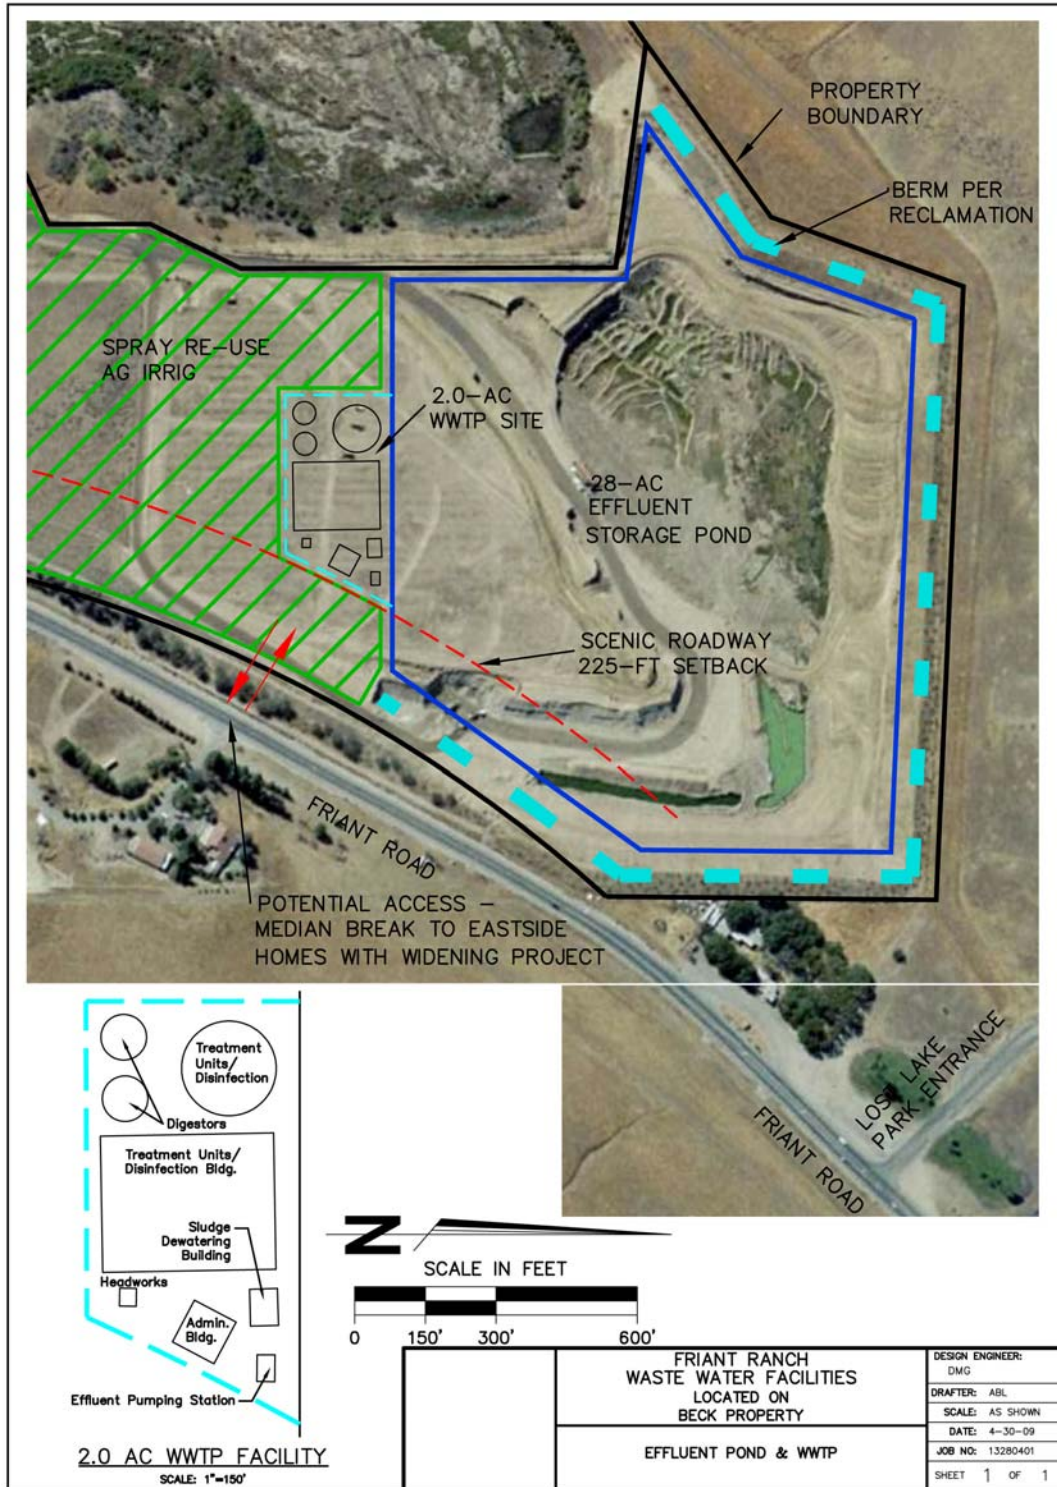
shows the Beck Property, and shows the general arrangement of a possible WWTP near the northeasterly corner of the property, adjacent to the south edge of the existing gravel excavation pit.
